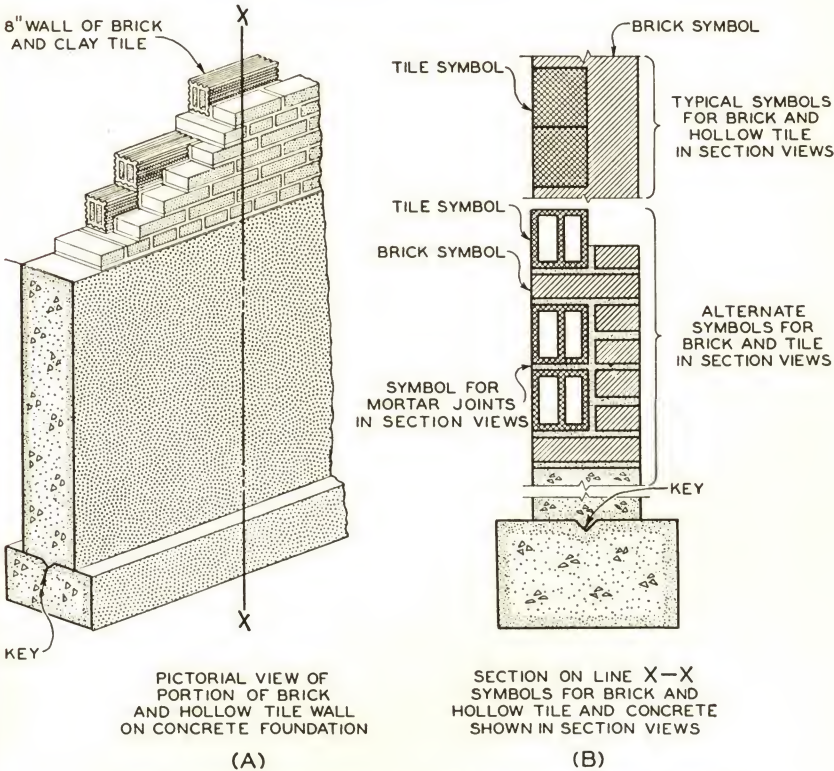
Pictorial and Section View of a Brick and Hollow Tile Wall
